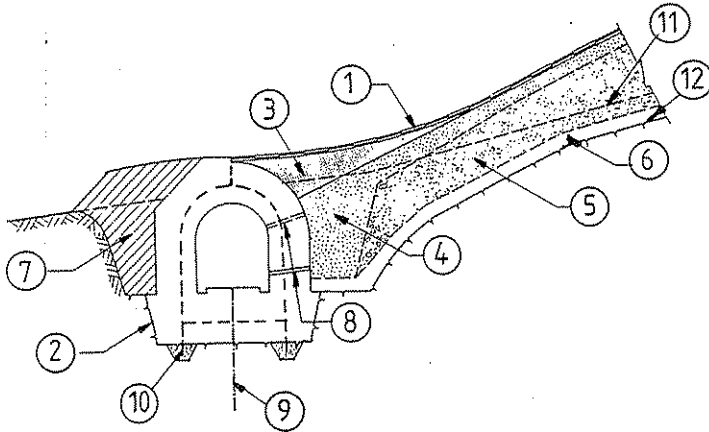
Embankment dam with uncontrolled face sealing of asphaltic concrete. Junction of the membrane and a gallery structure, example Pynnos (Mornos project, archives LI 1976).
